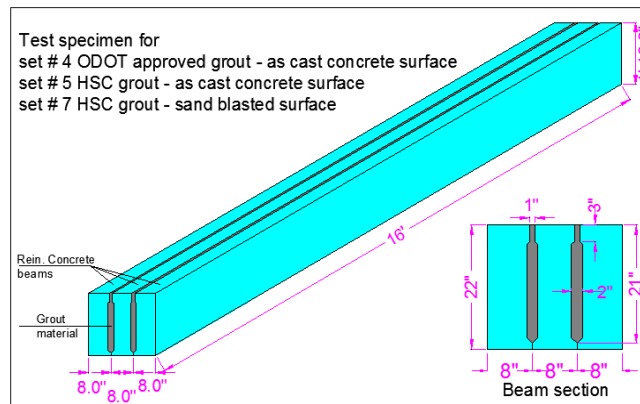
Test Specimen Details for Sets # 4, 5 and 7
